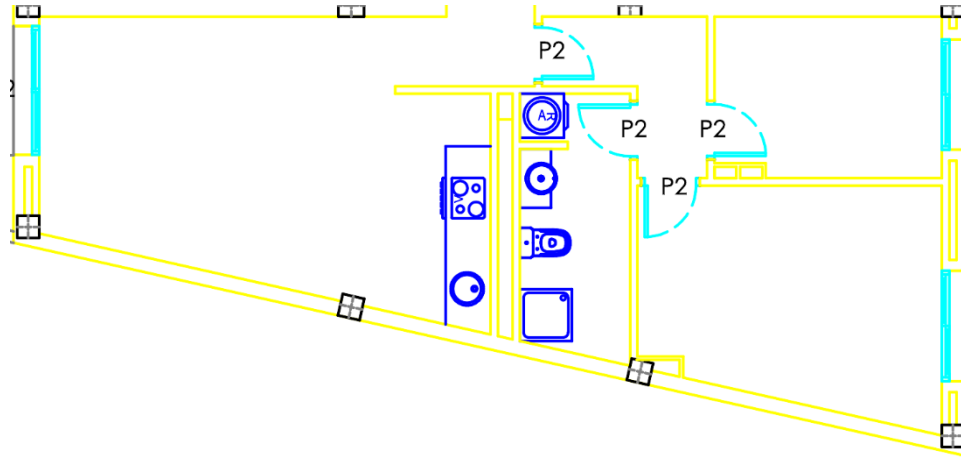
FLOOR PLAN OF THE APARTMENT 1 MENTIONED IN TABLE 2.18 AND IS MODELLED AS A SINGLE THERMAL ZONE
